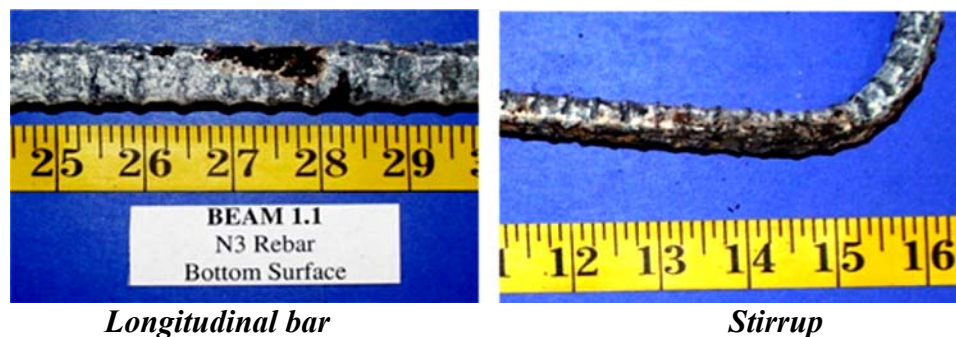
Specimen 1.1 - Mild Steel Bar and Stirrup
